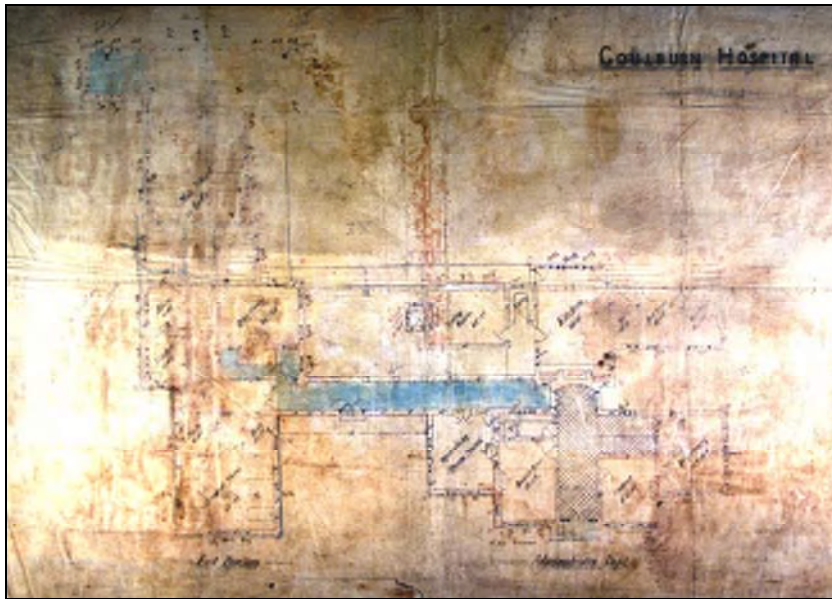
Undated, early sketch ground floor plan prepared by Manfred showing an early concept and basis of the Hospital plan with main two storey pavilion with entry, administration area, board room, operating theatre and stair connected to a kitchen wing at its rear and semi-detached two storey pavilion with wards and associated rooms.
